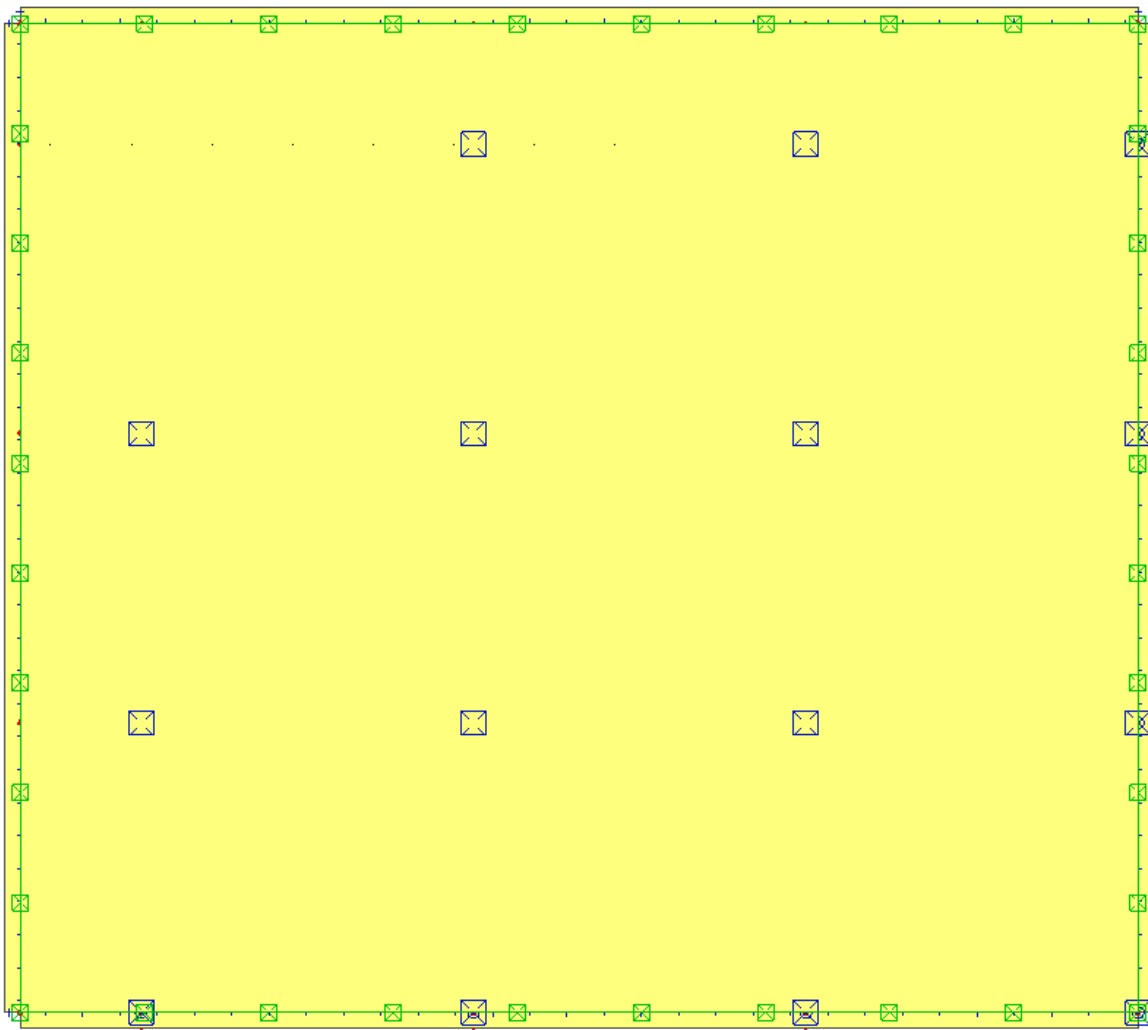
SCIA model, bottom view, anchors placed under the Flexbase floor
